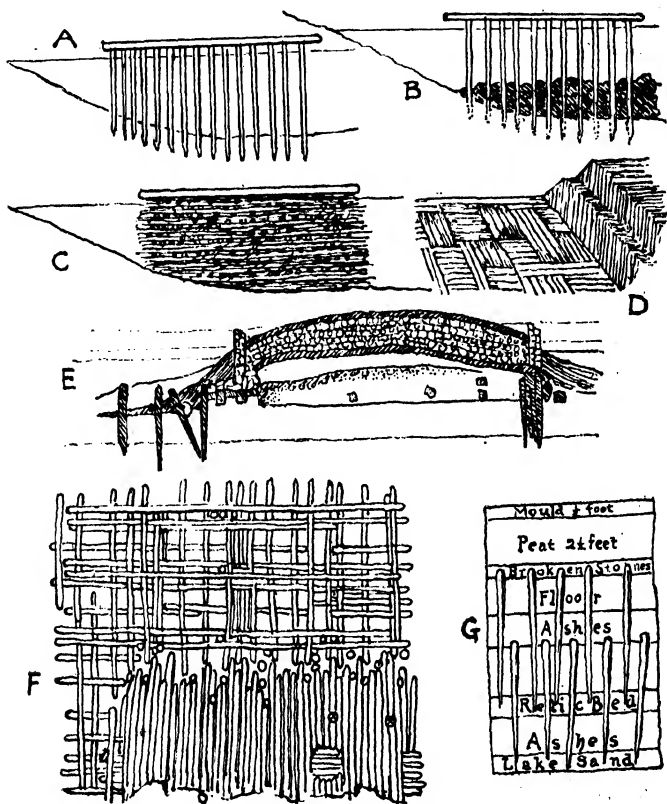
Section and Plans, Lake Dwelling Substructures from Keller.
